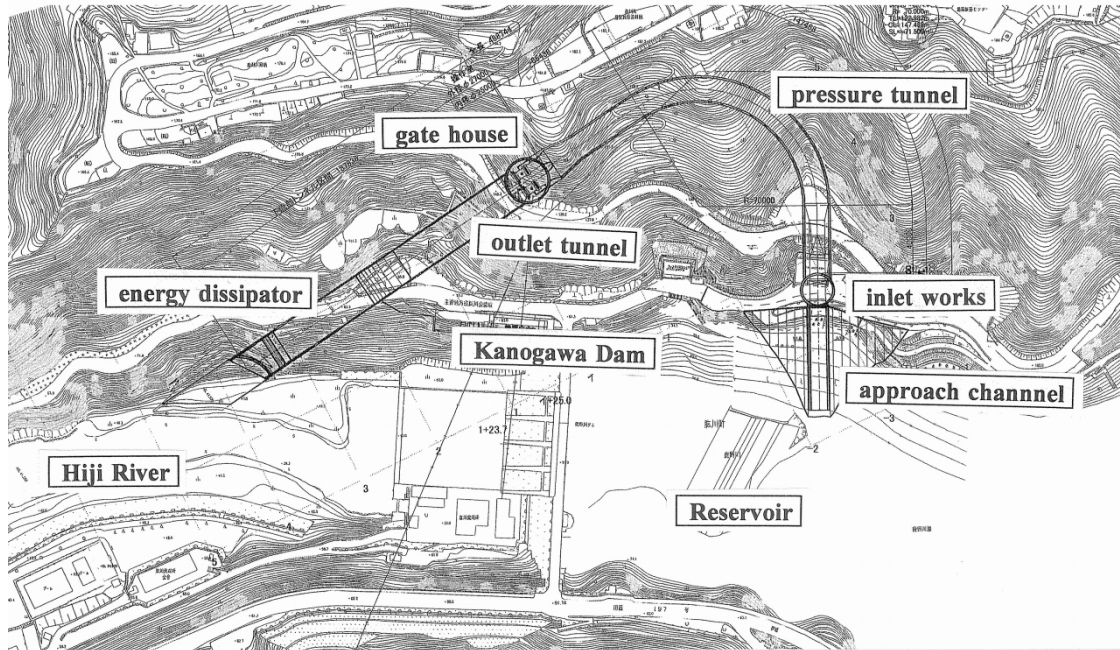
Tunnel spillway project of Kanogawa Dam (plan)
